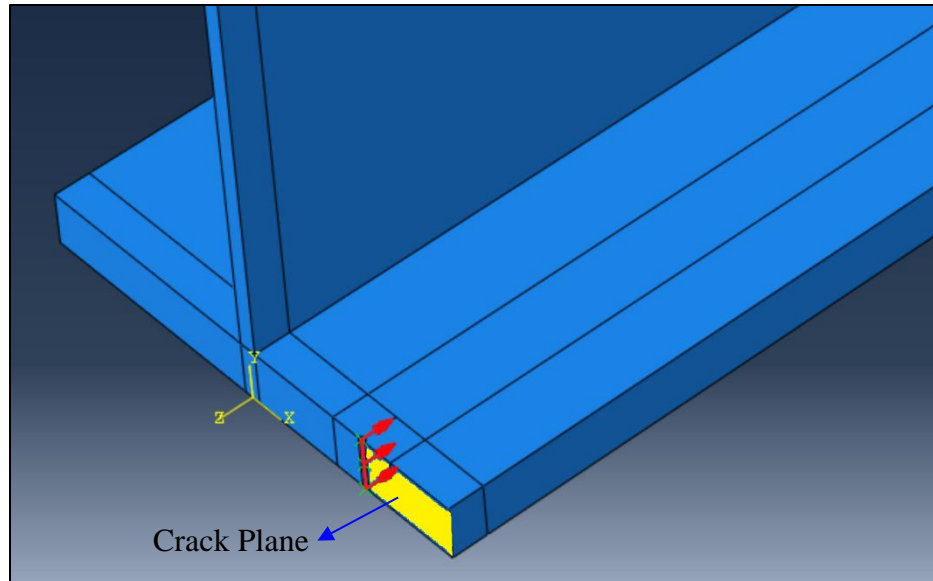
Edge Crack Plane in the Tension Flange
